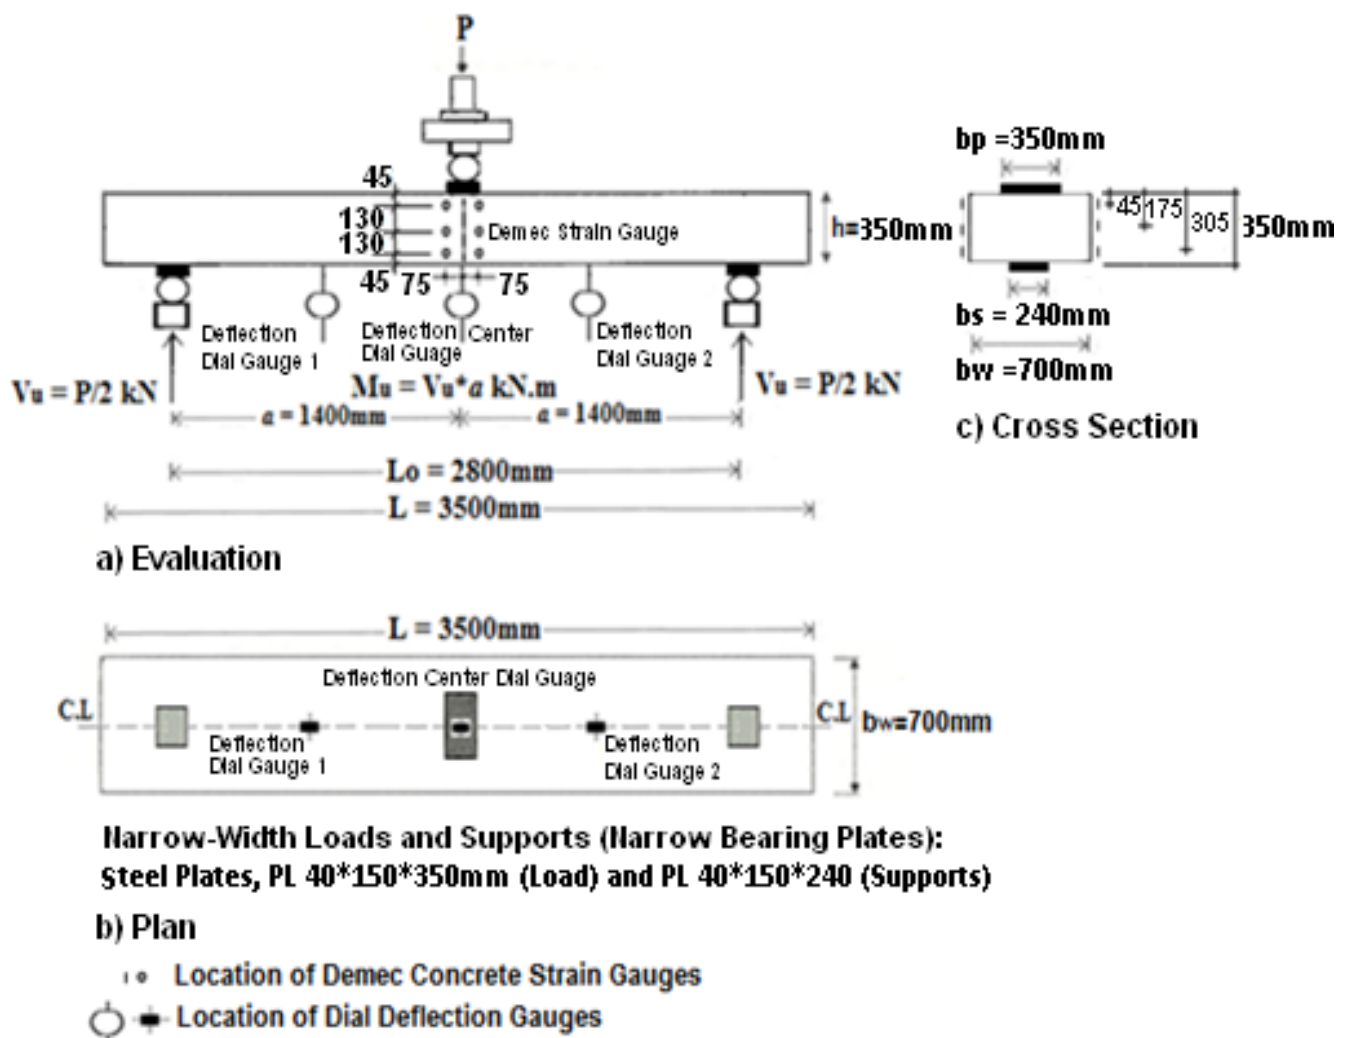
Details of Wide Beam Specimens in Test-Series "A".
